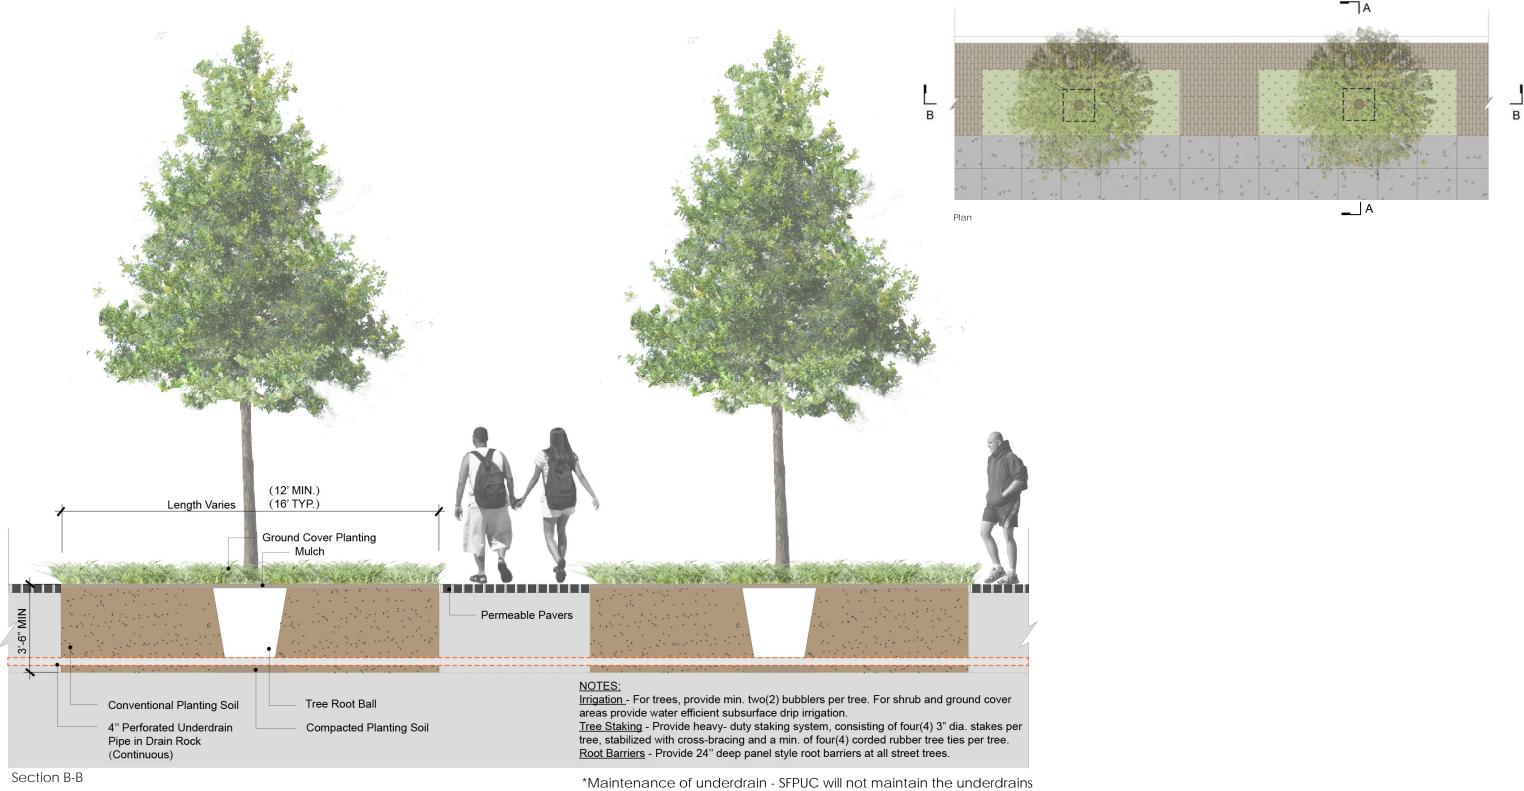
Street Tree Planting Condition 1: Street Trees in Open Planting Areas
